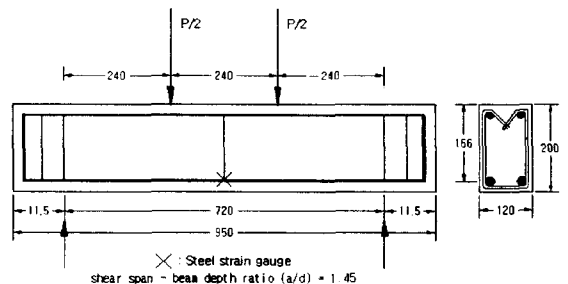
Details of test beams (unit : mm) with a/d=1.45
